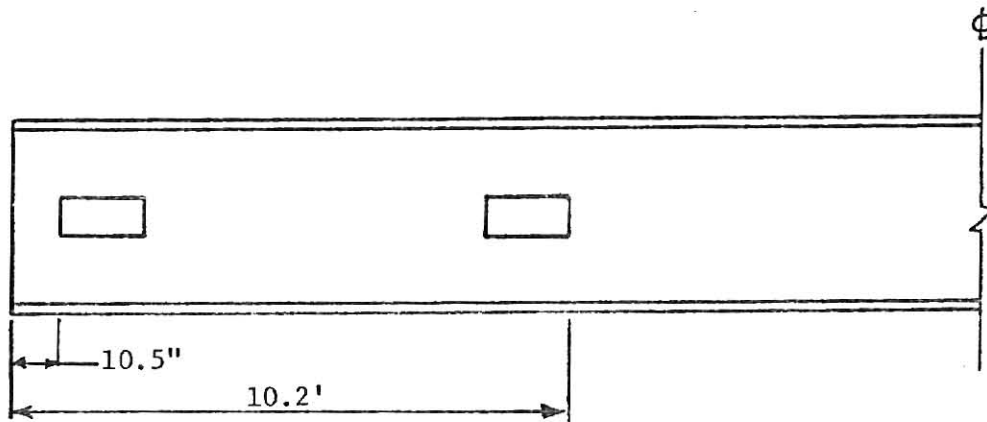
Permissible Opening Locations for Floor Beams with  $A_r = 1.26 \text{ in}^2$
